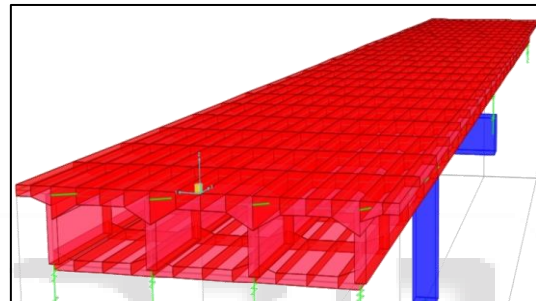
Multi Cell Box Girder of Exterior Girders Vertical
